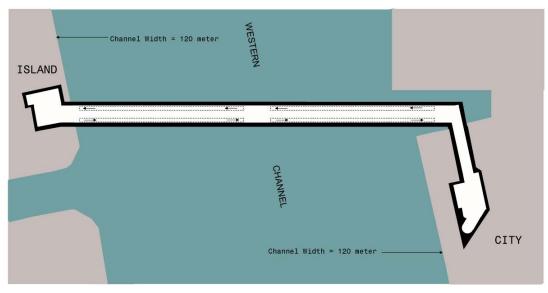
Proposed plan by TPA (Source: Toronto Post Authority's Website)
